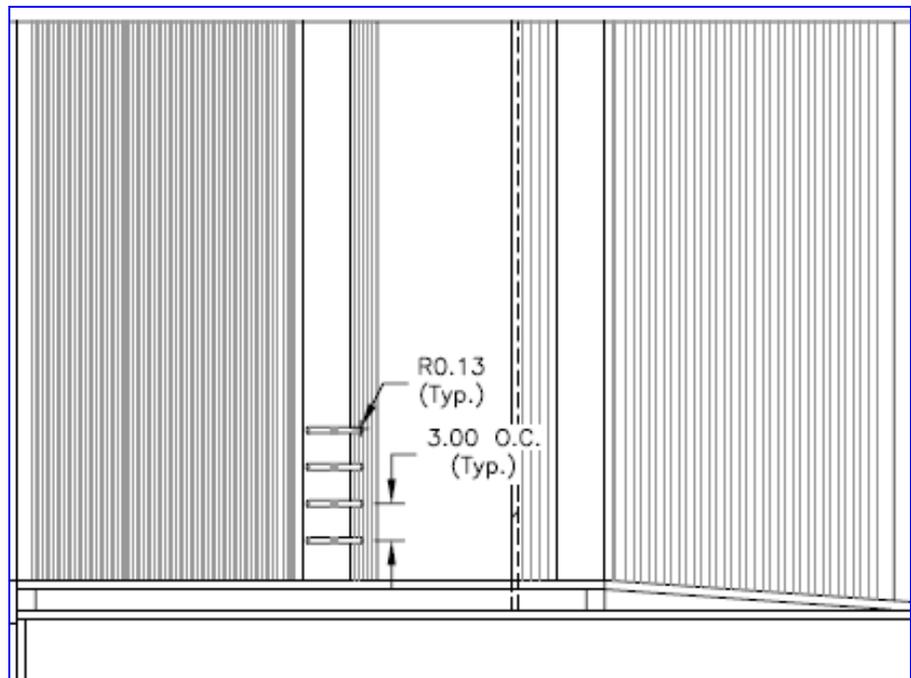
Count Station – Elevation View —Excerpt from Model Drawing 3-19 provided by ENSR (Inches Model Scale: 1:5)
